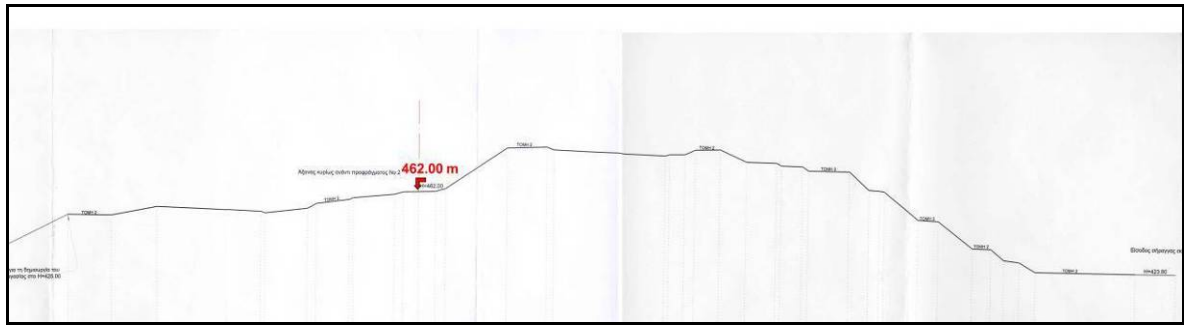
Typical Cross Section of Main Upstream Cofferdam on the Acheloos River
